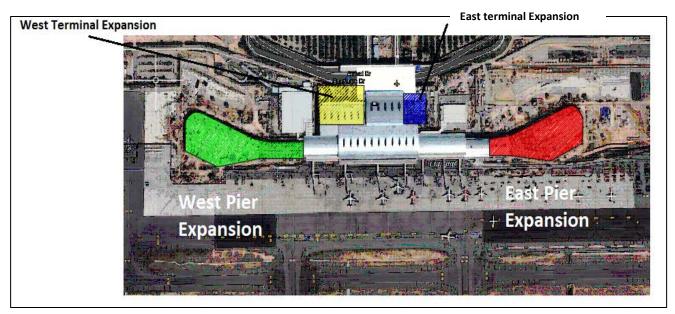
Google image of Proposed Passenger Terminal Building Expansion
